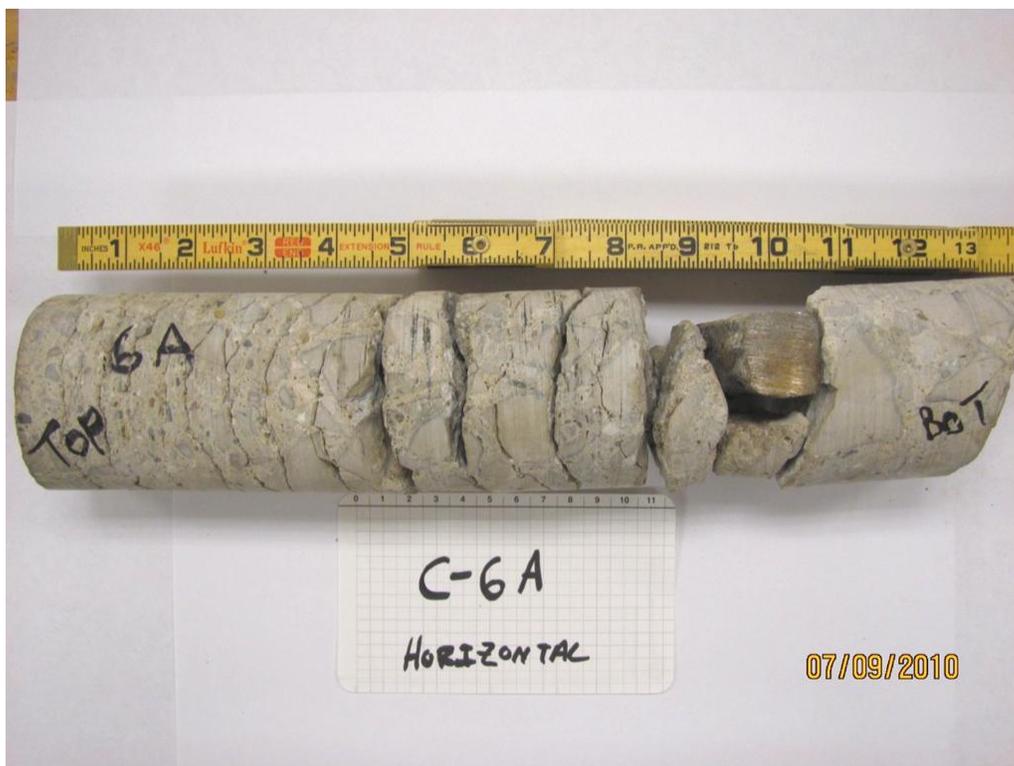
View of Core C-6A. Note cracking in the aggregate and cement paste.
